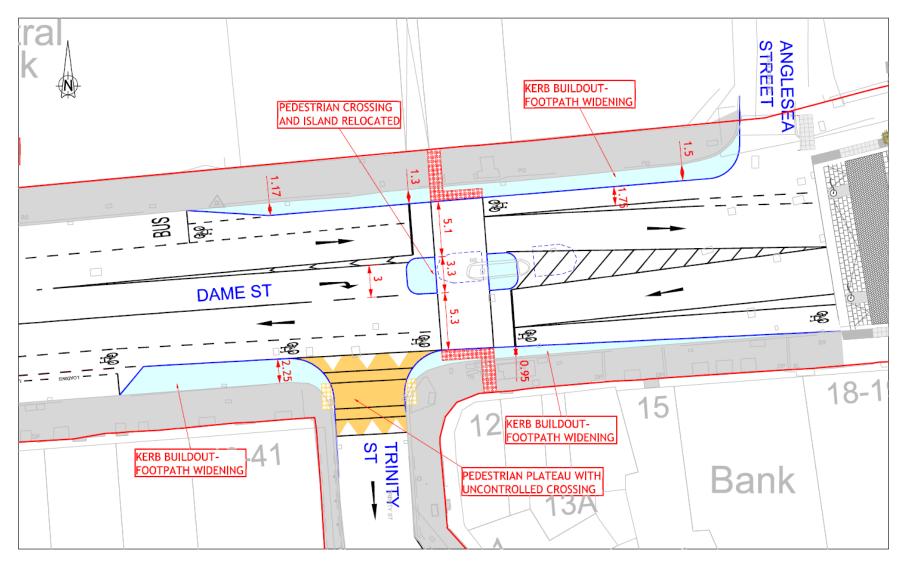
Road Design Detail- Dame Street, Trinity Street
